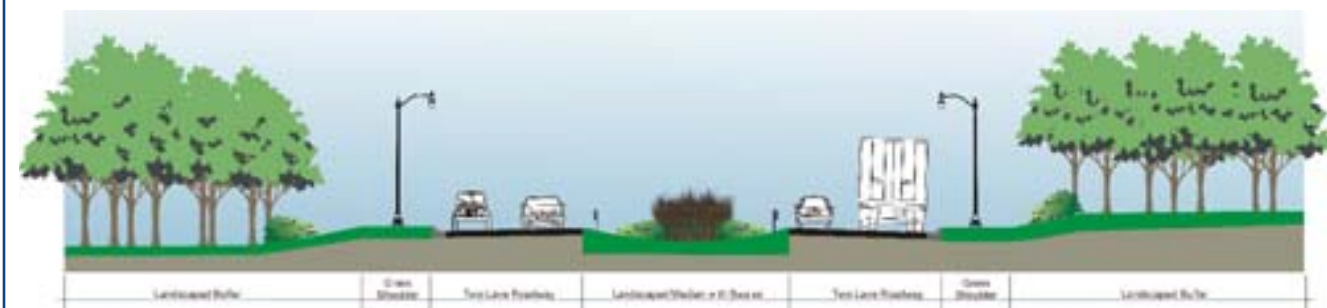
Typical Cross-Section Between Pennsylvania Avenue and East Capitol Street
